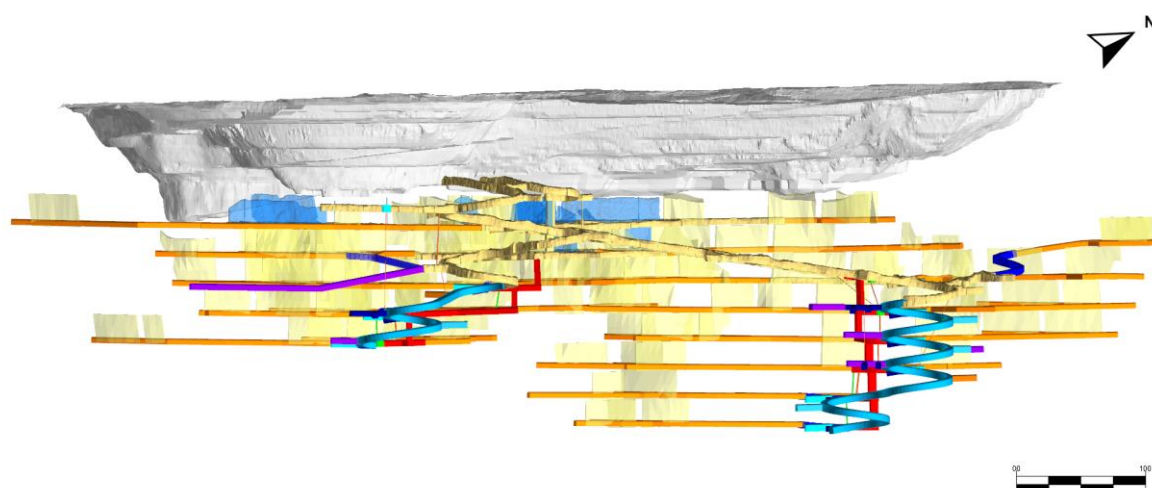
Sand King Underground Ore Reserve mine design with Sand King pit (looking north west)
